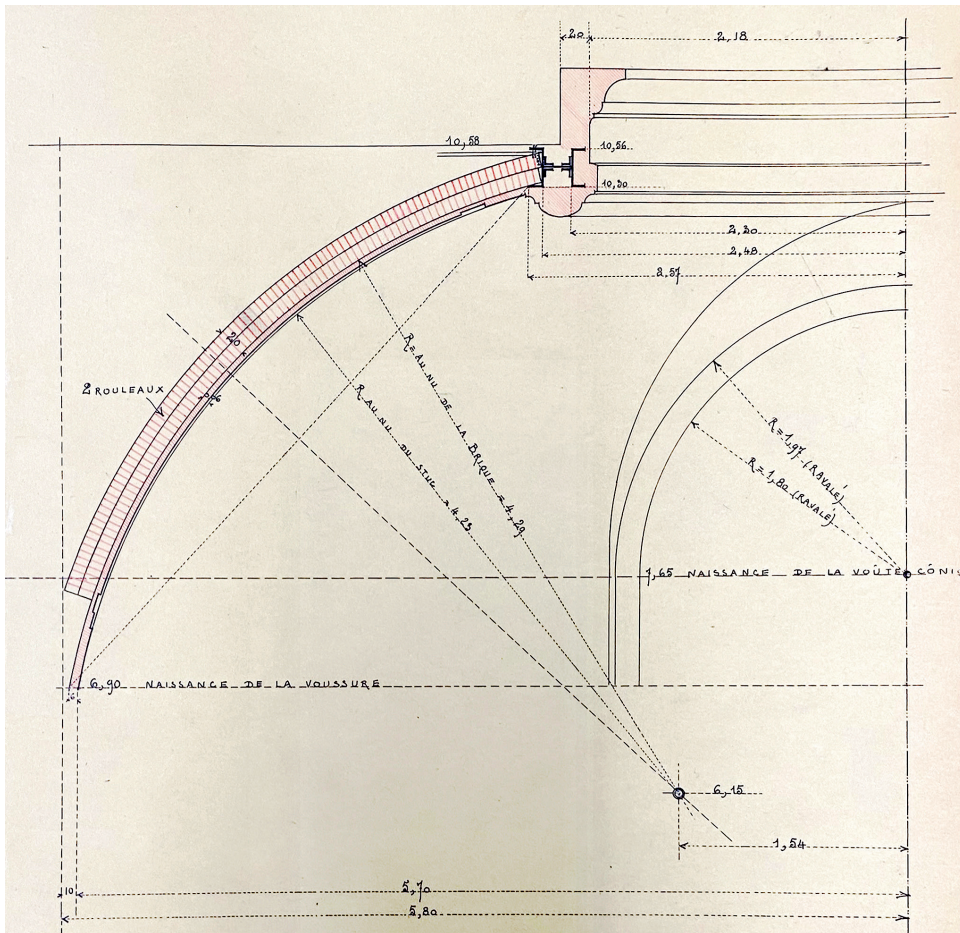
Construction of the vault in the hall (Detail of drawing no.177, HA.01.0827.20, RMCA Tervuren collection, Charles Girault archives).
